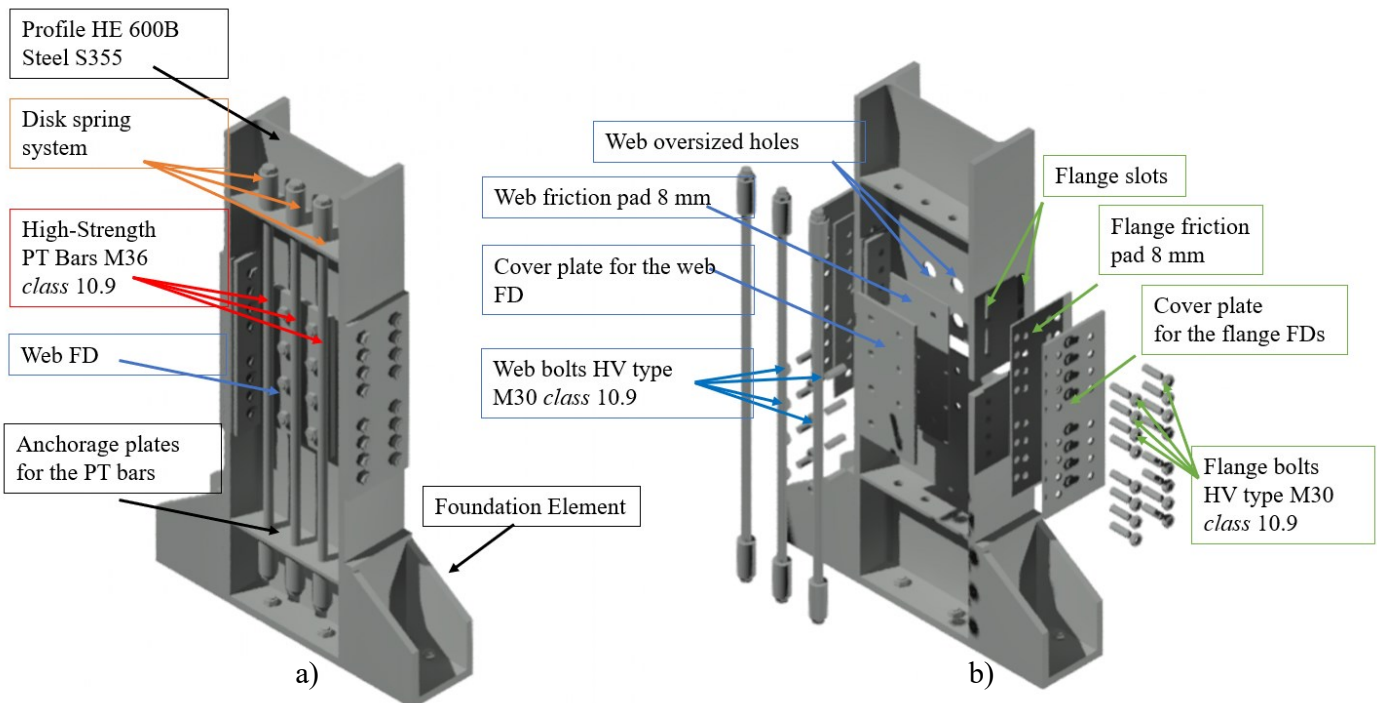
SC-CB connection for the MRF3: (a) 3D view; (b) Exploded 3D view
